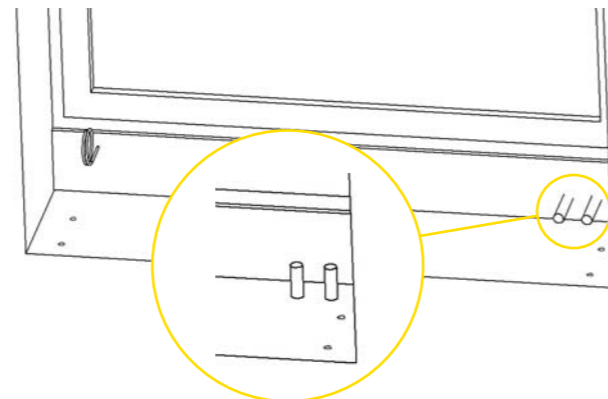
Drill marked holes for dowels. Install the power supply cable and pipes. Pipes can be brought from behind or underneath the convector.
